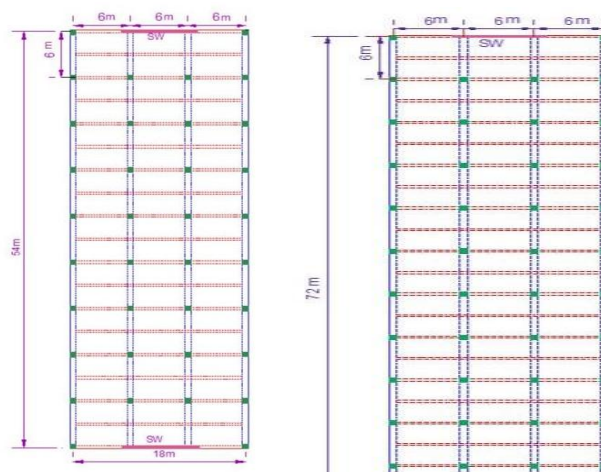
Plan of the building with Aspect Ratio 1:3 and 1:4
